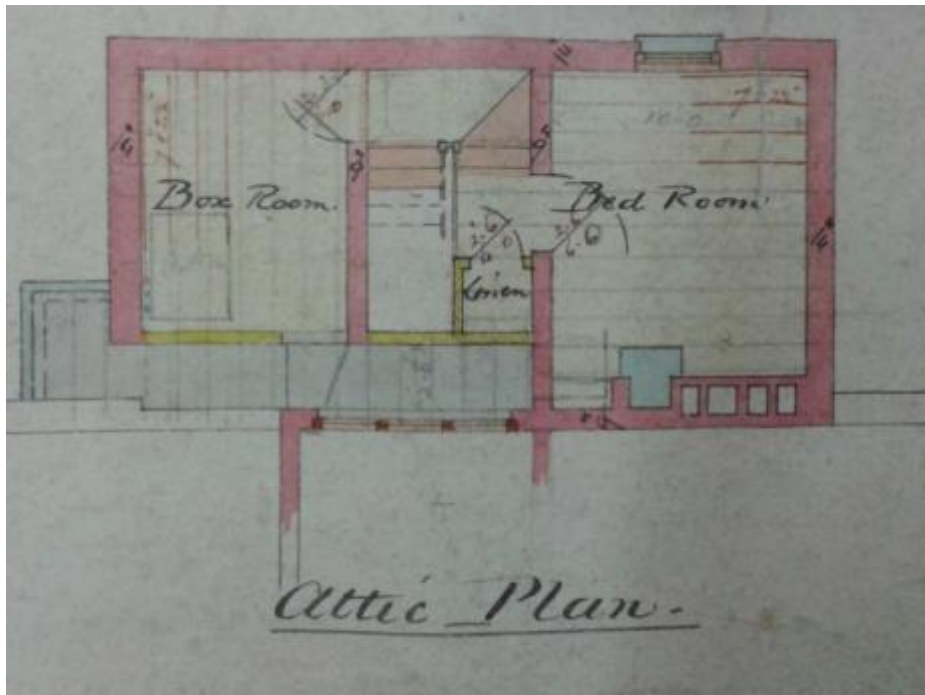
Plan of attic bedroom at the new vicarage for St Paul's, Lincoln, May 1888. LA Par/9/16.
